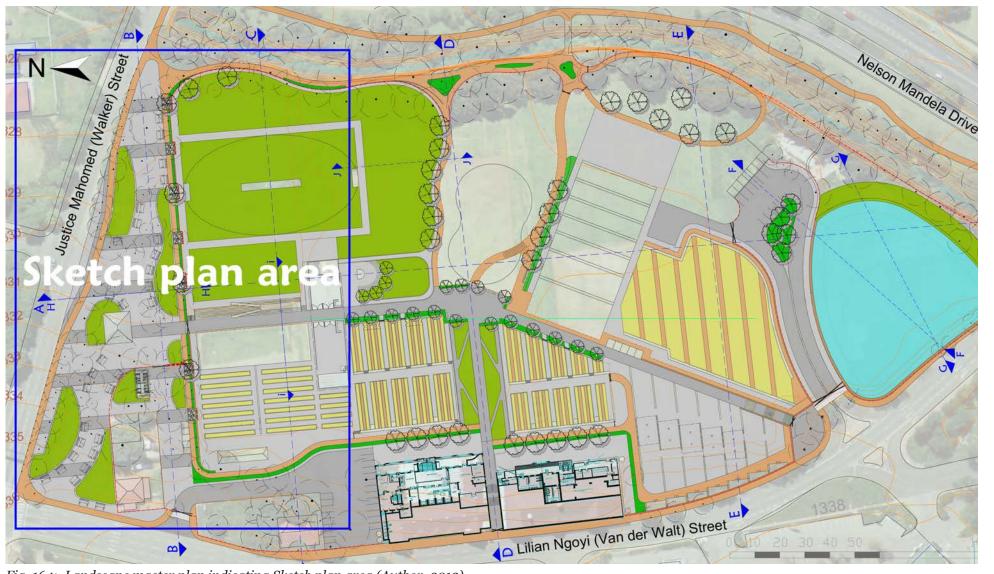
Landscape master plan indicating Sketch plan area (Author, 2013)
